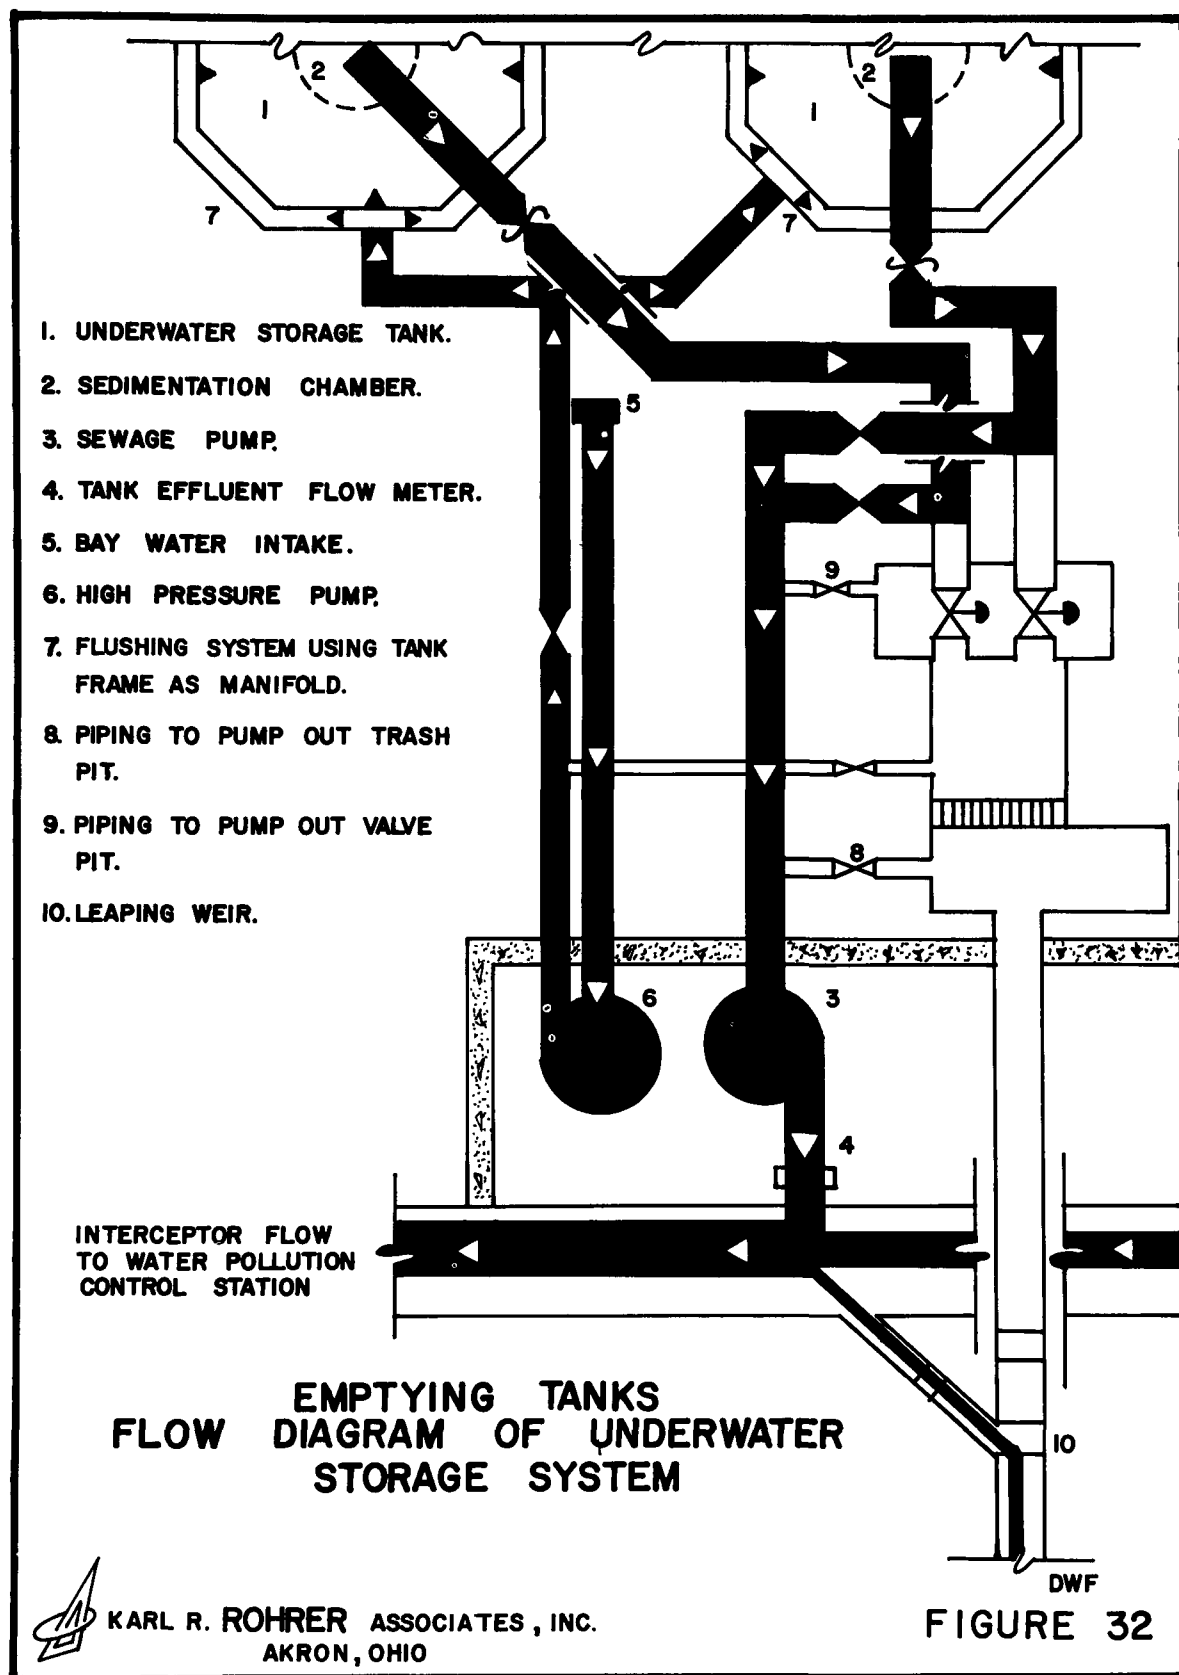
shows the system flow plan for emptying of the underwater storage tanks after a storm event.
